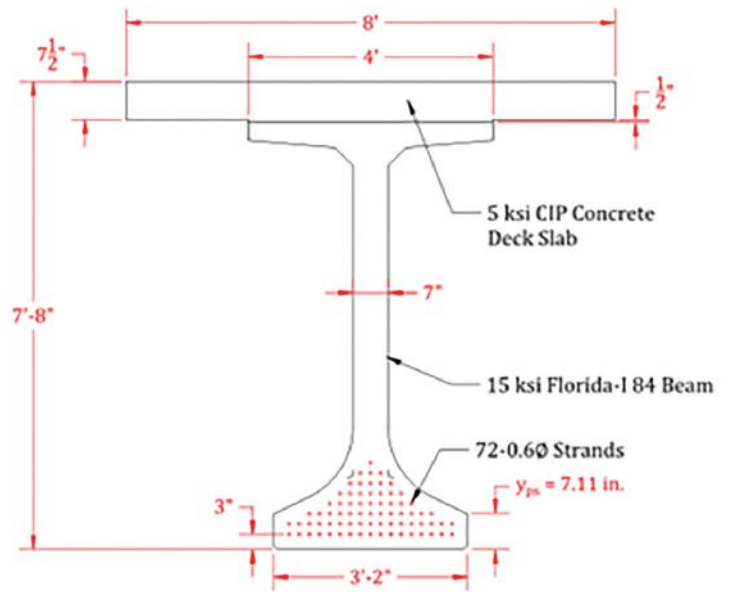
An 84-in.-deep Florida I-beam girder made composite with a 7.5-in.-thick, cast-in-place (CIP) structural deck slab.
